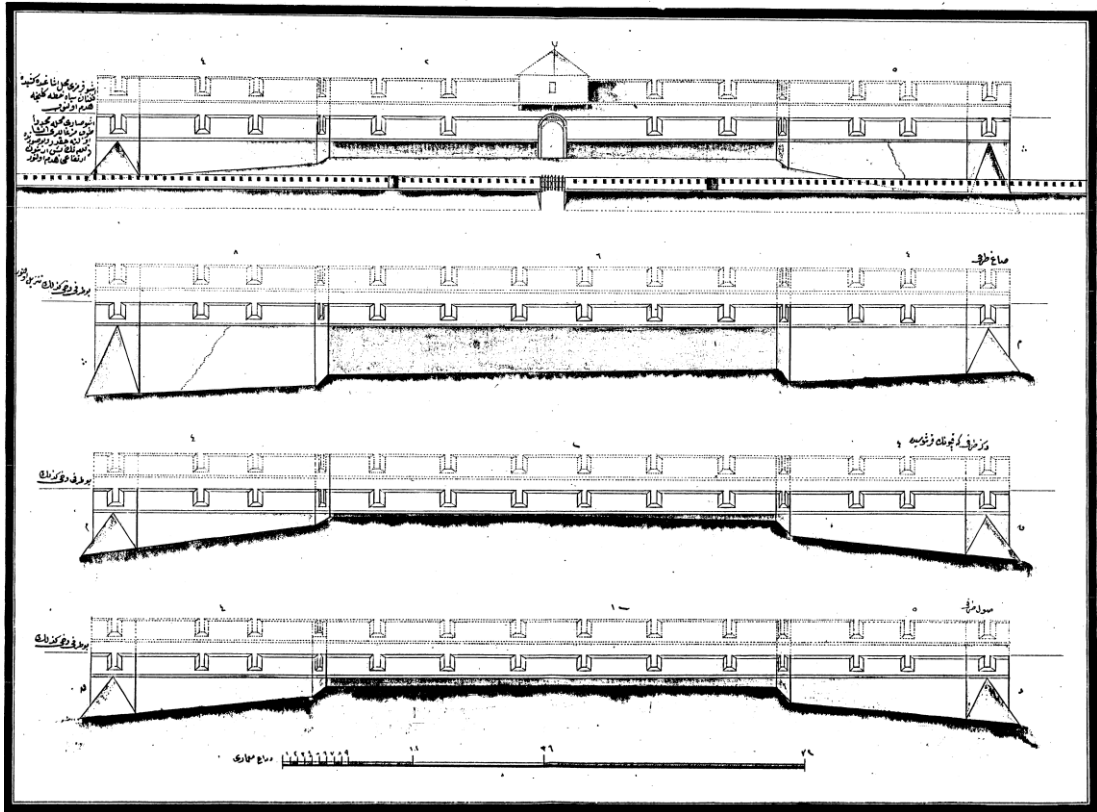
Plan of the Reconstruction of Kilyos Fort from its foundation by razing half of its walls. “İşbu kırmızı mahal aşağıda keşide kılınan siyah hatta gelince hedm olunub işbu sarı mahalle müceddeden top mazgalları inşa olunacaktır ve bu sûretde kal’anın beş arşun irtifâ’ı hedm olunur.” (BOA. HAT. 143/5978.)
